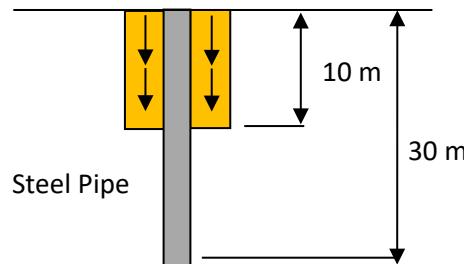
30 m embedded steel pipe in uniform soil subjected to downdrag
